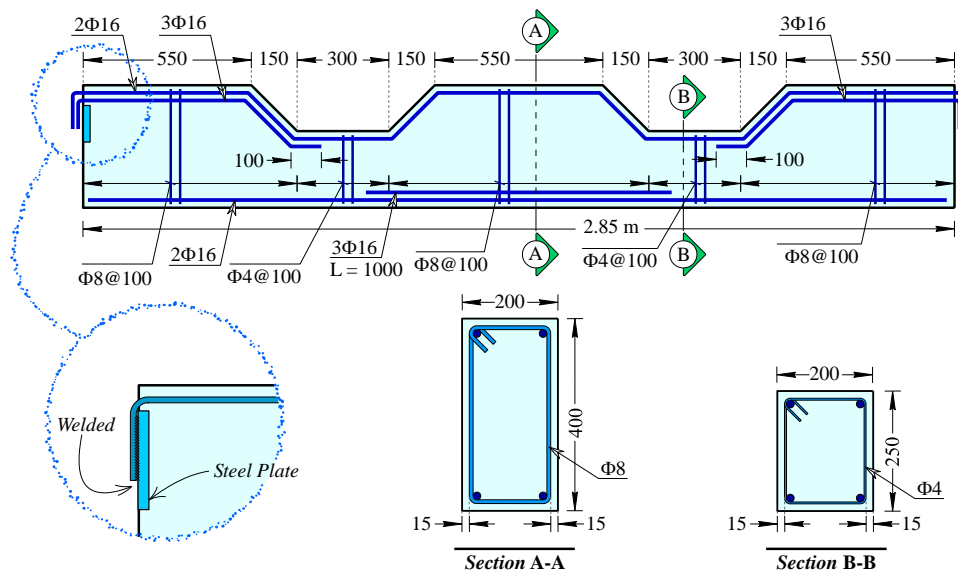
Specimens dimension and reinforcement (all dimensions in mm)
